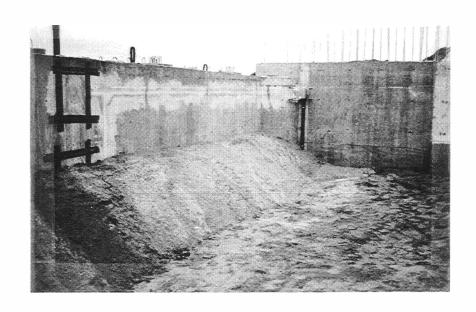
CLSM Approach Embankment Area After Initial Preparation, North Abutment, Bridge B
